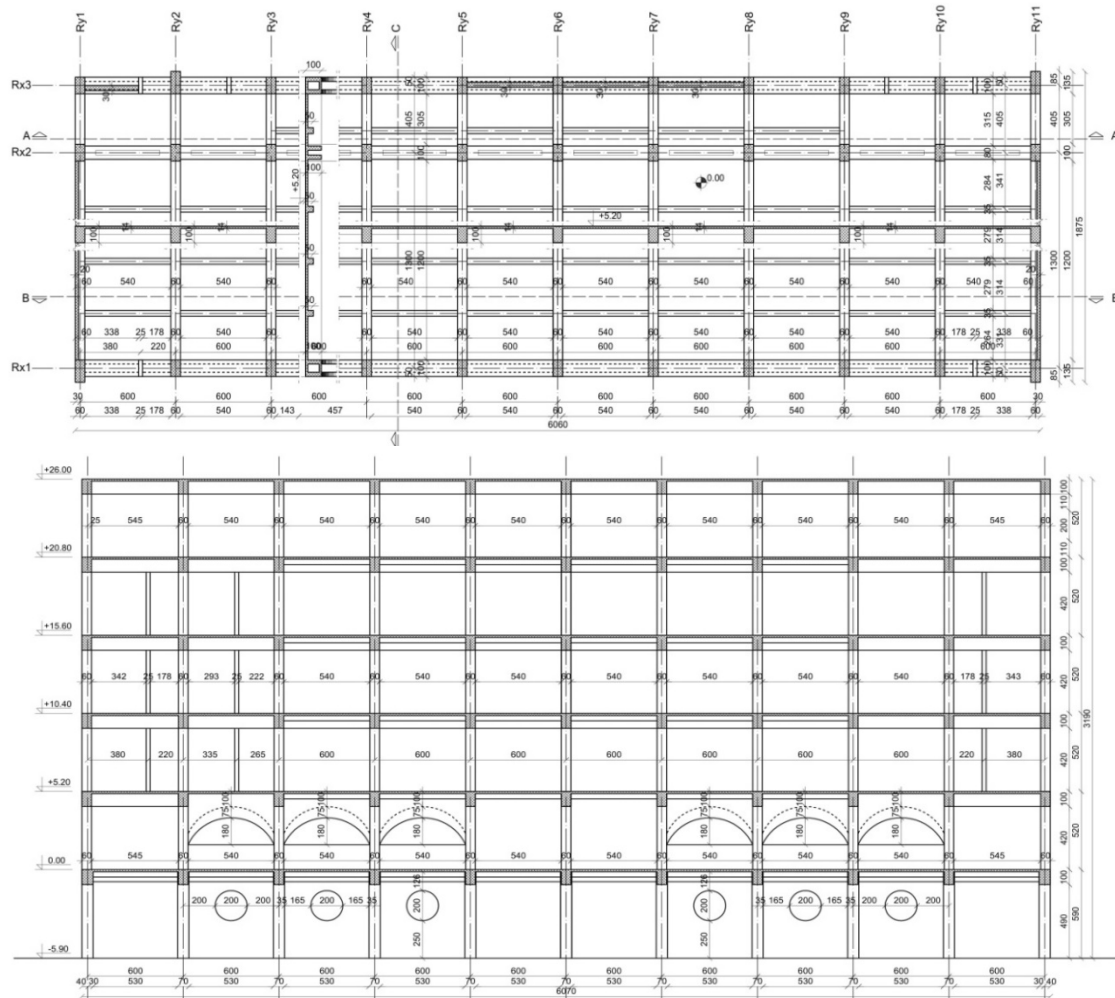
Layout of the ground floor (upper) and longitudinal cross-section (lower) of the building.
